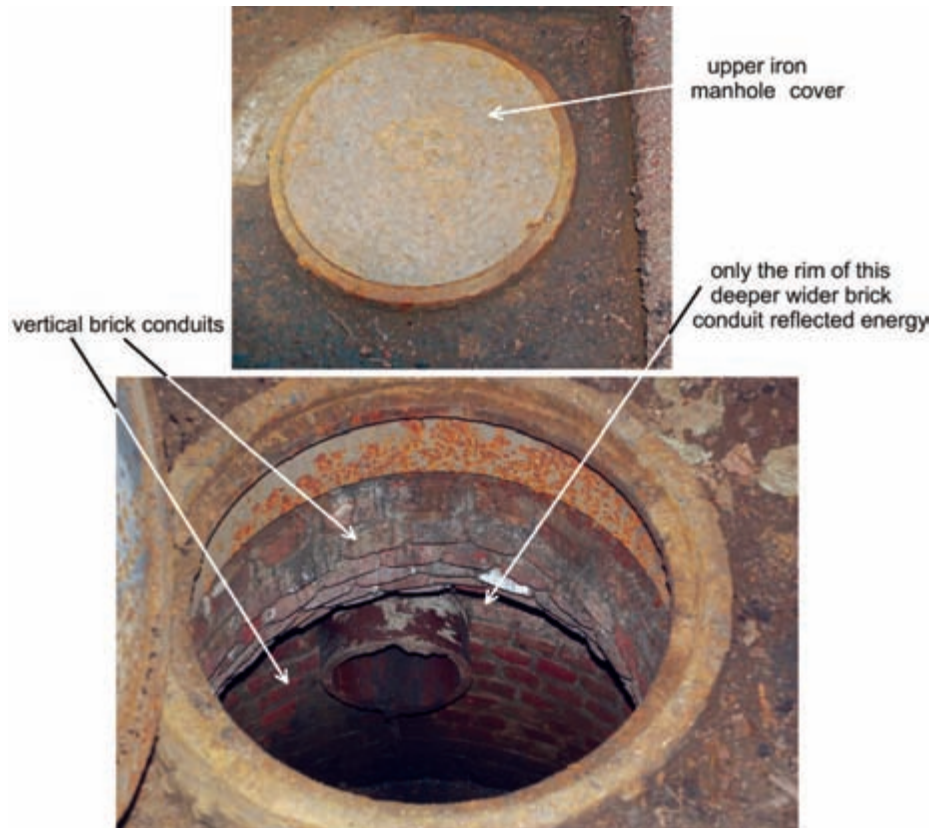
Manhole cover and brick conduit. When uncovered, the manhole visible with GPR in Figures 7-6 and 7-7 turned out to be from an abandoned water pipe. The cover was opened and can be seen to lead to a brick conduit leading to a deep water main used for domestic water to New York City. *Images courtesy of Meredith Linn and Herbert Seignoret.
